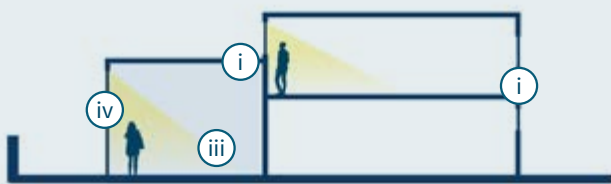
Introducing floor-to-ceiling windows with an increased ceiling height to the living space can provide daylight deep into the building while retaining outlook from upper levels.
